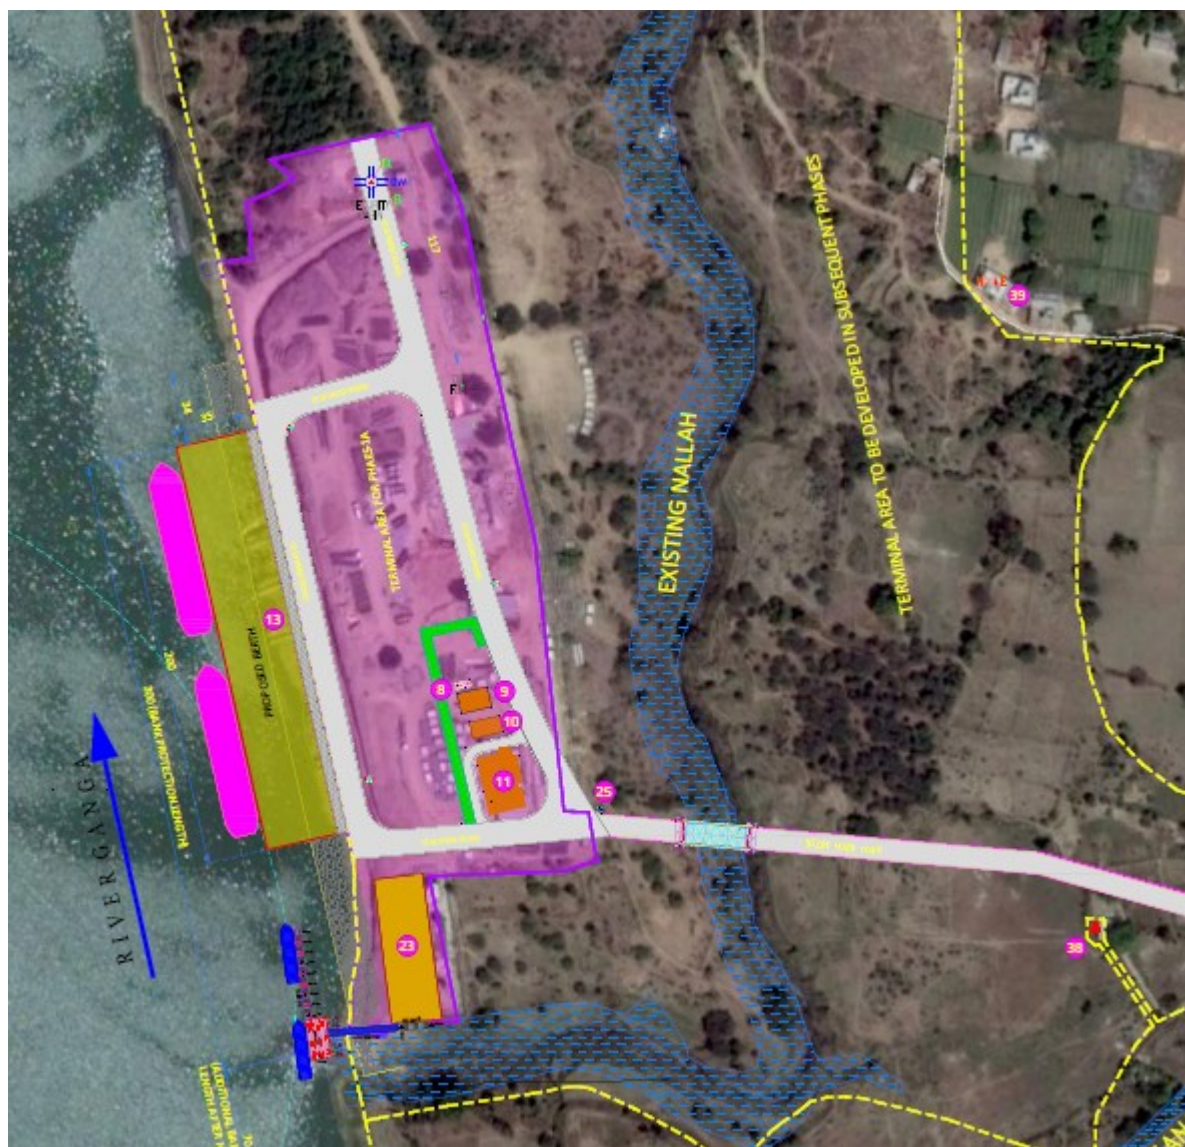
Varanasi MMT - Layout Plan of Terminal Facilities during Phase 1A Development
